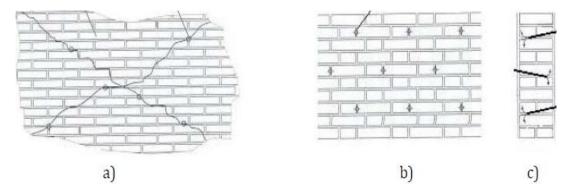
(a) injection in external/face diagonal crack; (b) injection for the internal cracks; (c) side view
